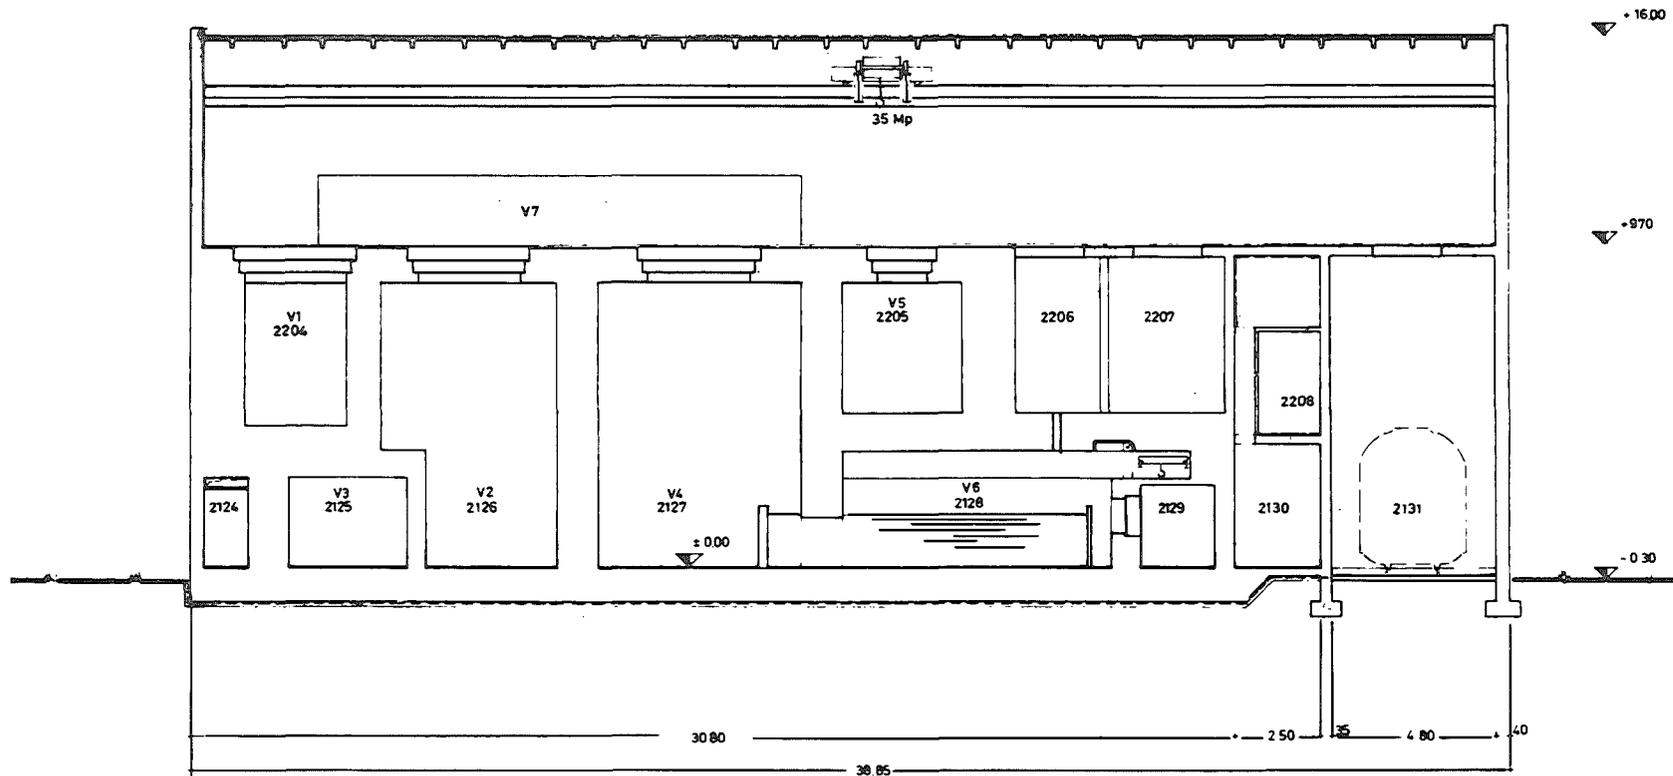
LAYOUT OF THE VERA 2 BUILDING
